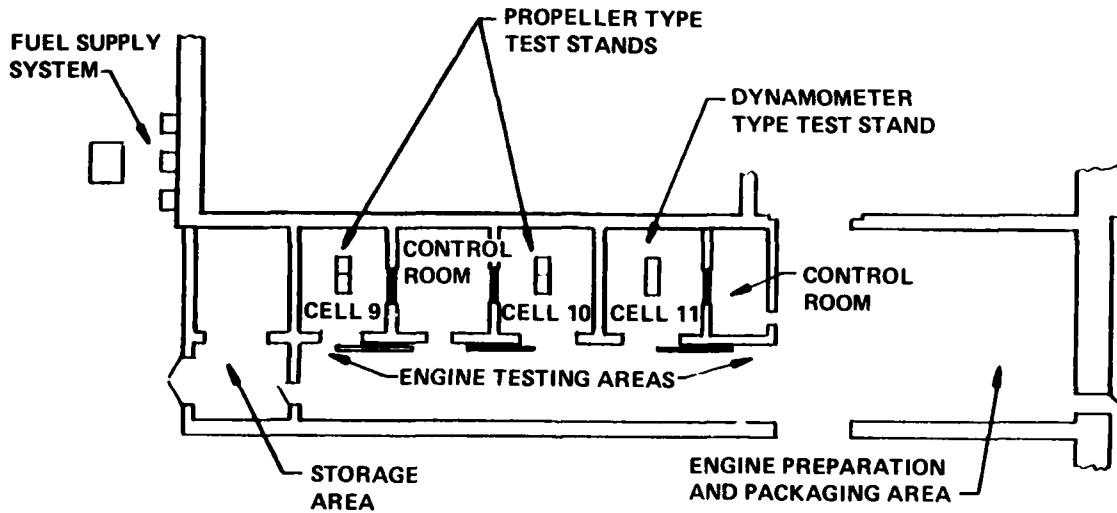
FLOOR PLAN OF THE MINI-RPV AREA LOCATED IN BUILDING NO. 26.
